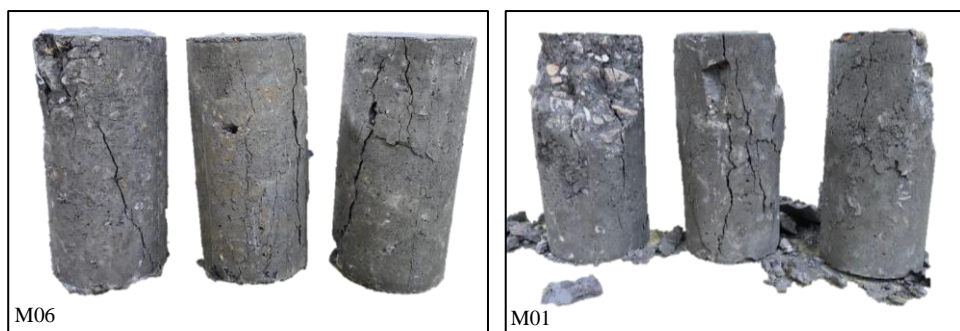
Failure patterns of cylindrical specimens under unconfined compression testing
